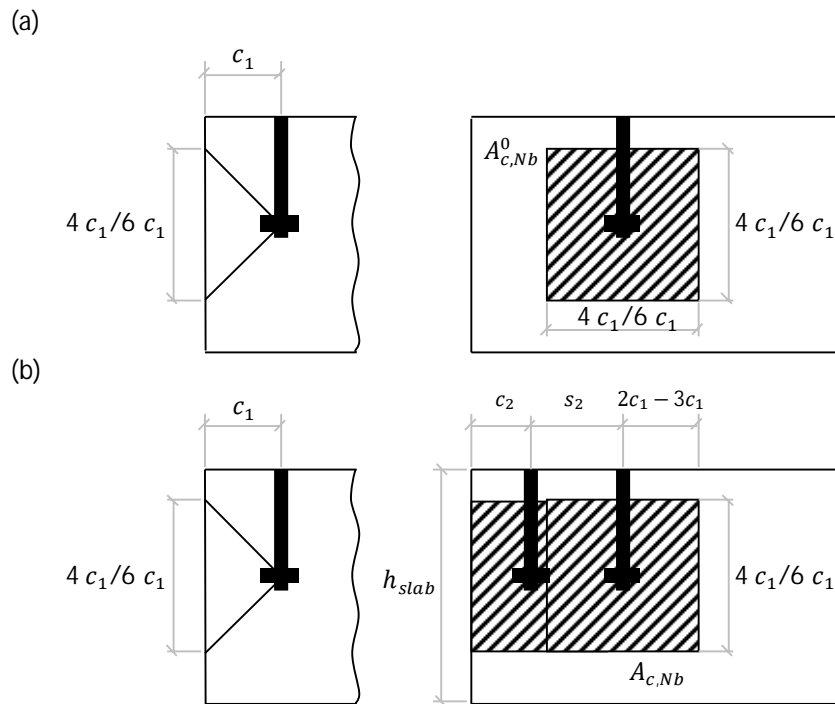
Concrete break body for blow-out failure: (a) Individual fastener; (b) Fastener group limited by near edge.
